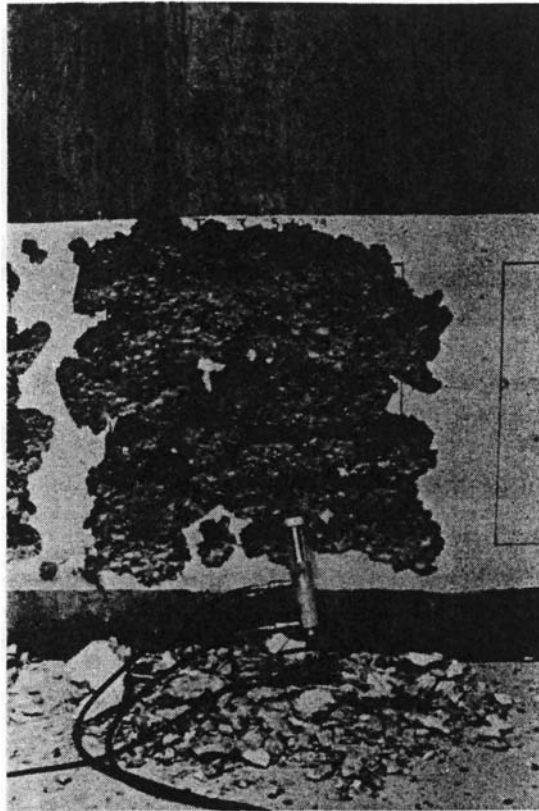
Concrete Spaller Next to Spalled Test Panel
